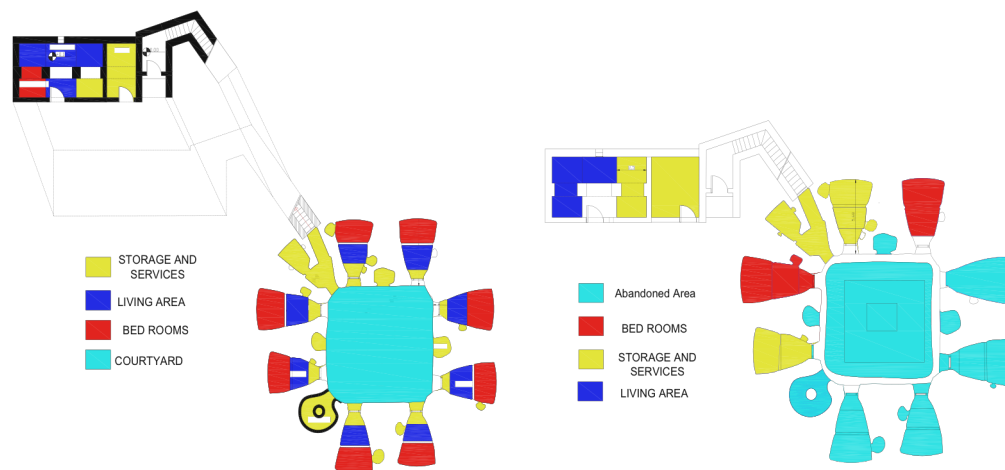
23) The original and contemporary space use - earth sheltered house.
